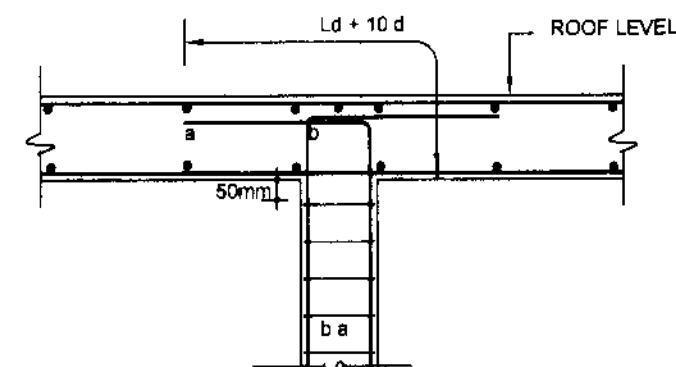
(c) TYP. DETAILS OF A BEAM-COLUMN JN
